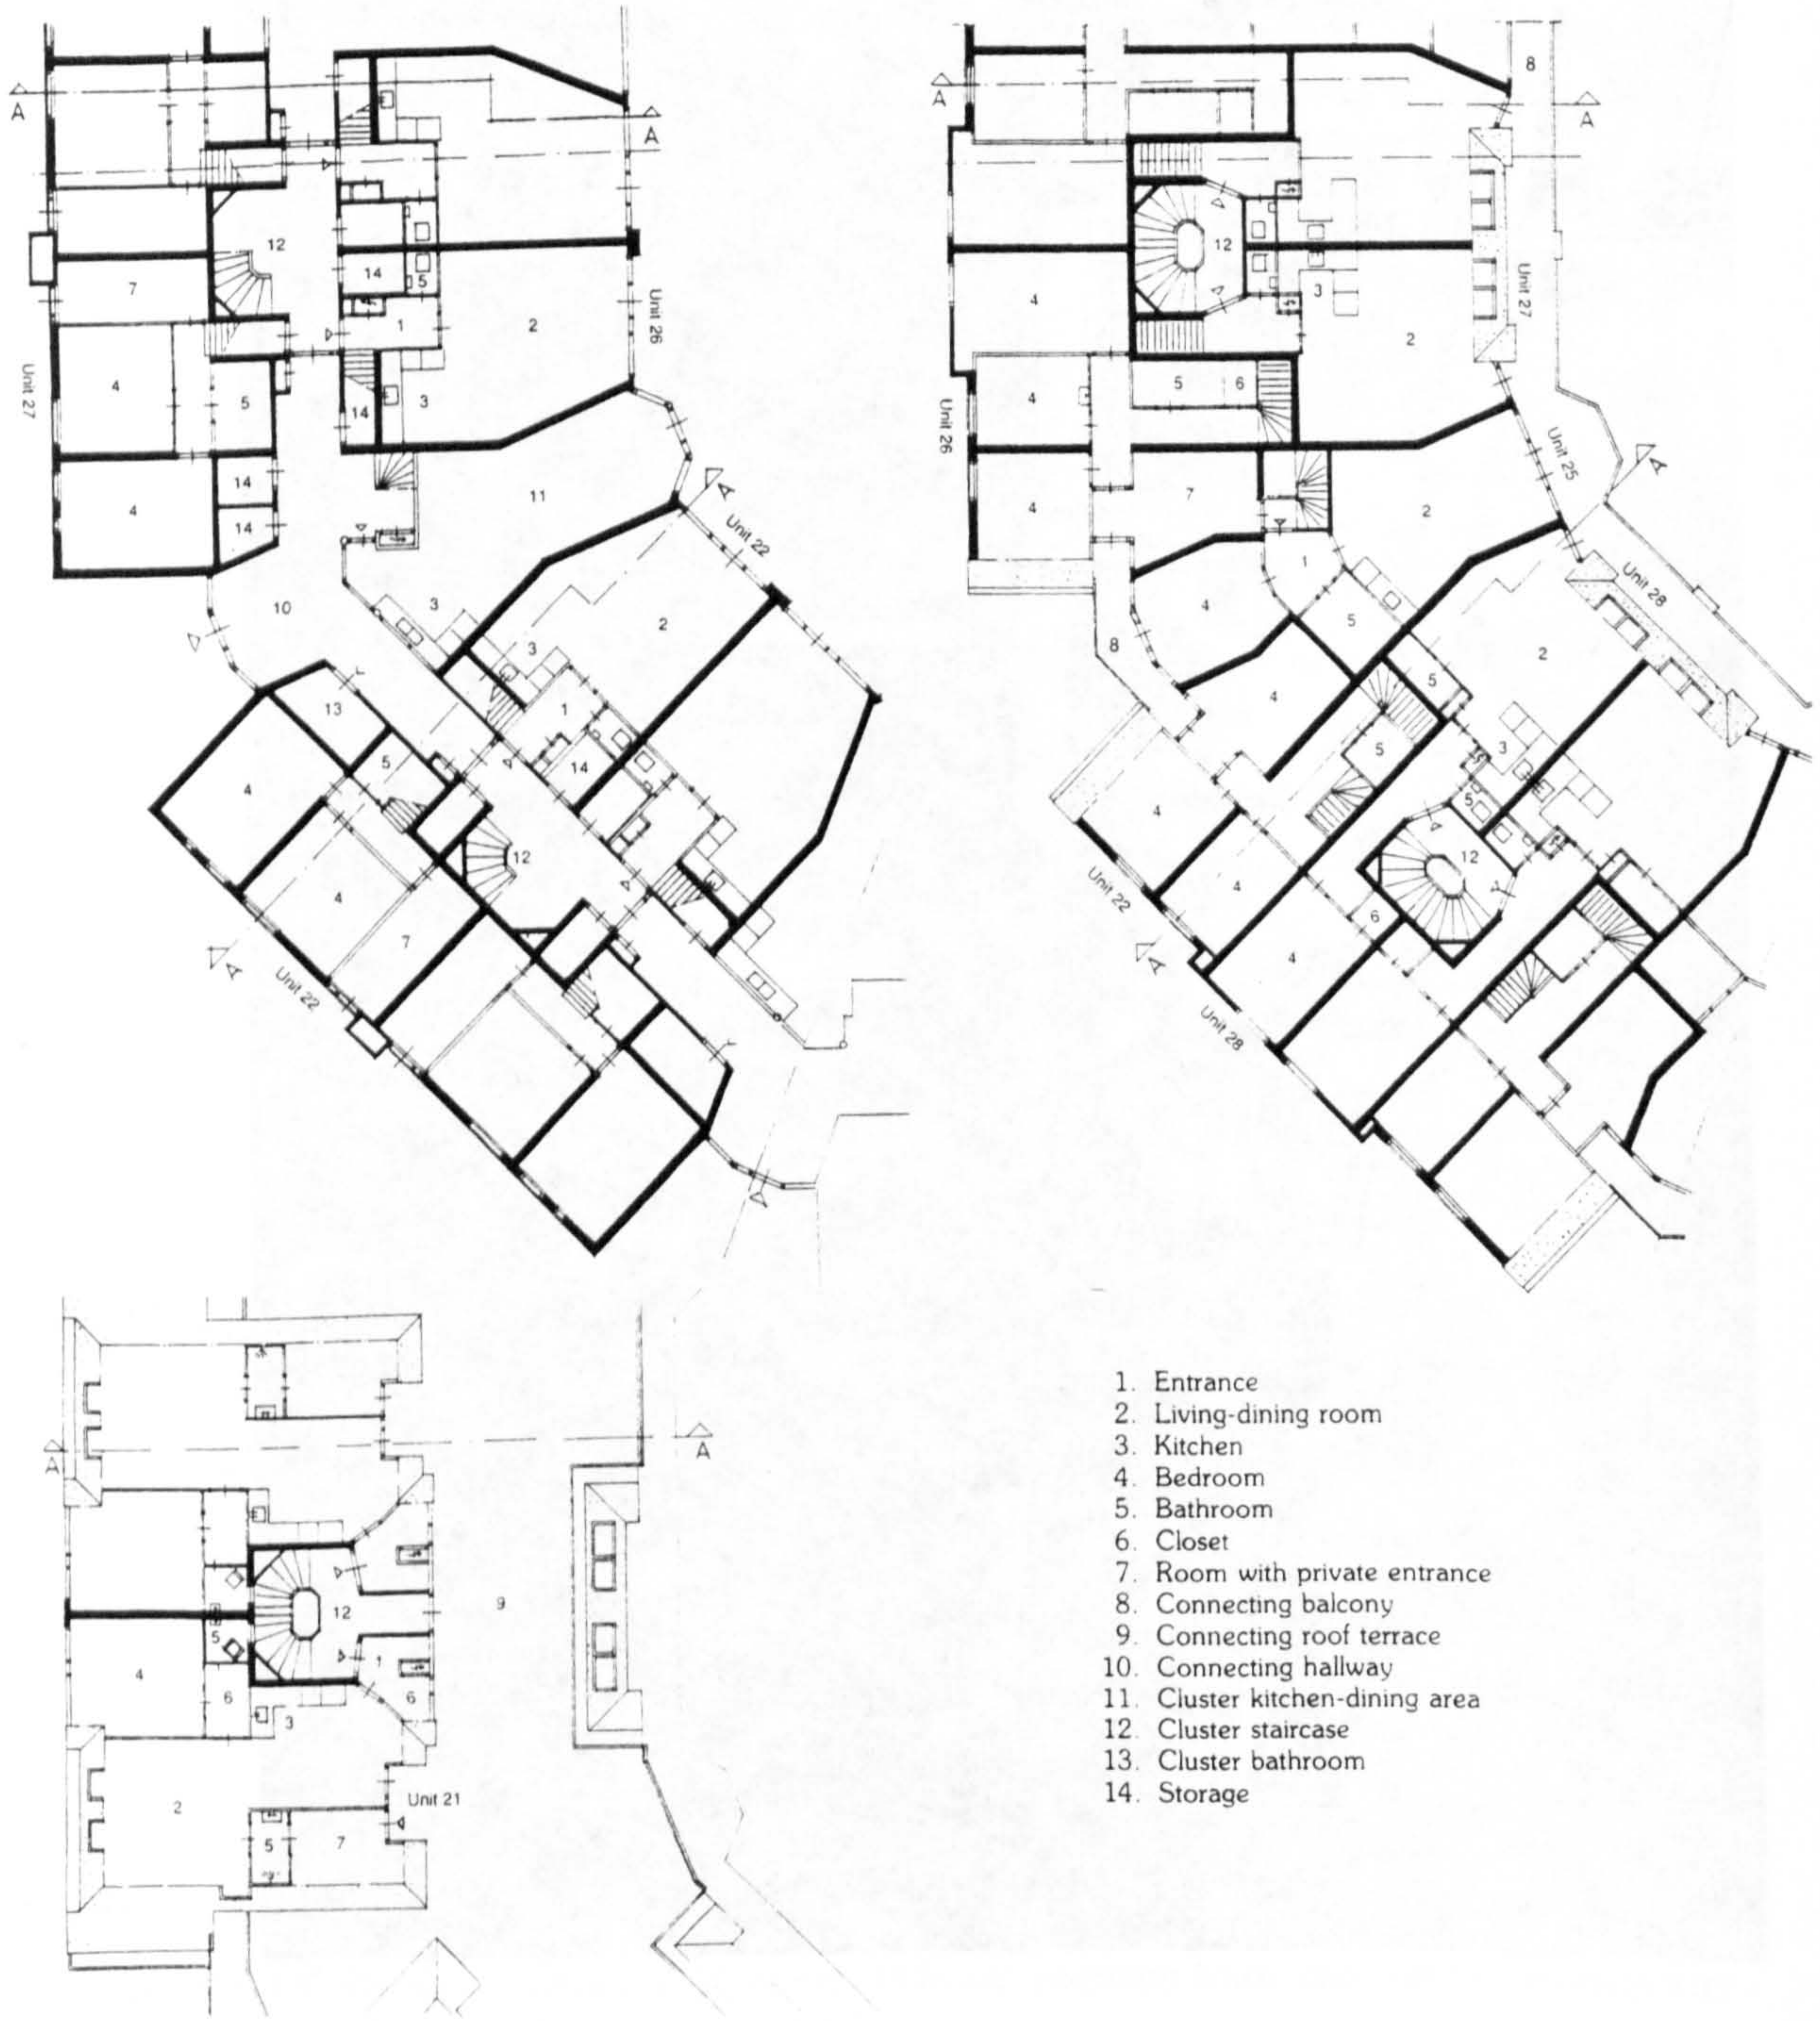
Woon Kollektief: section and floor plan<sup>122</sup>
